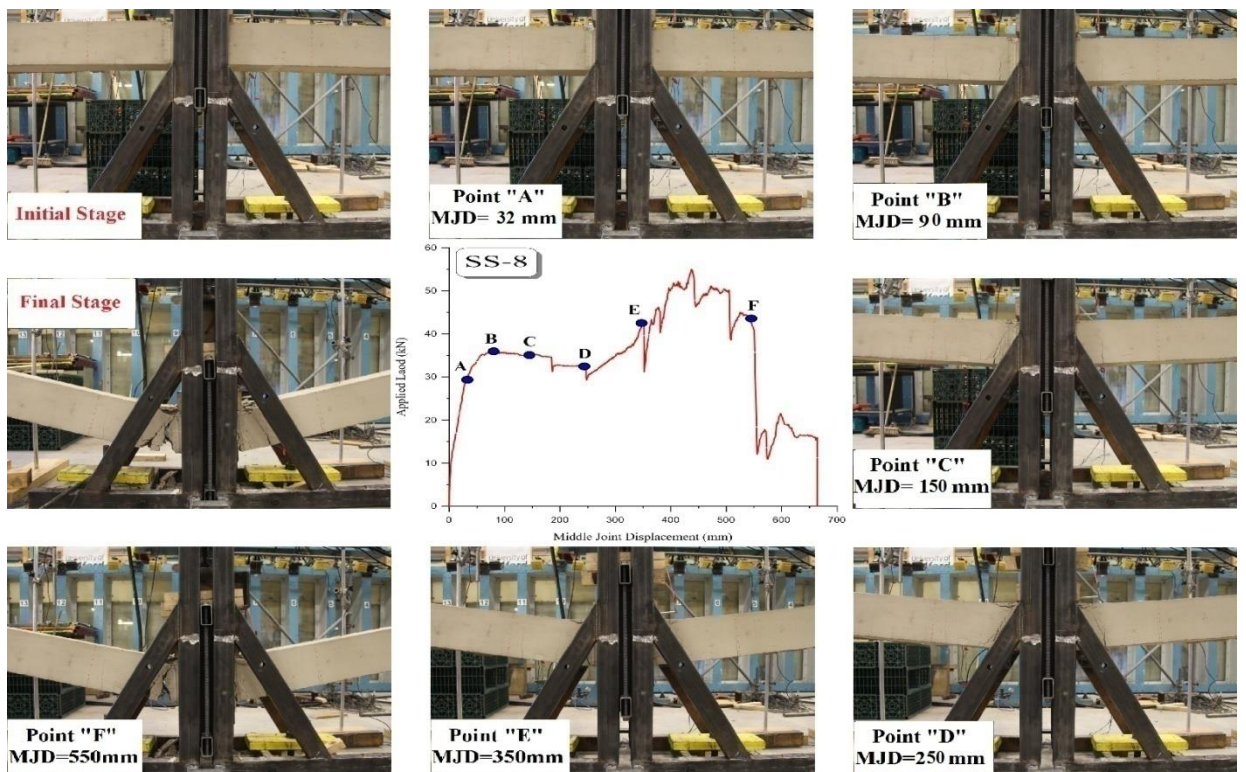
Crack Development at Different Stages for the Middle Joint of Specimen SS-8
